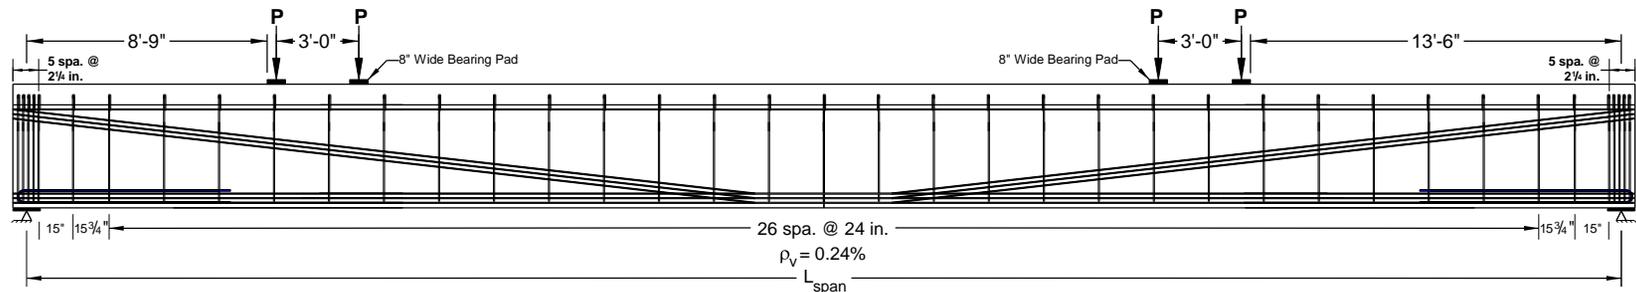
Elevation view of test girders showing stirrup spacing, harped prestress tendons, and concentrated load locations.
